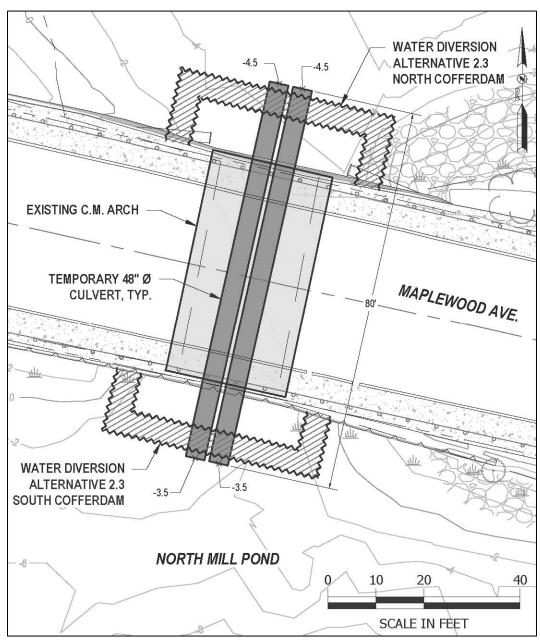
Water Diversion Alternative 2.3 Schematic Plan
